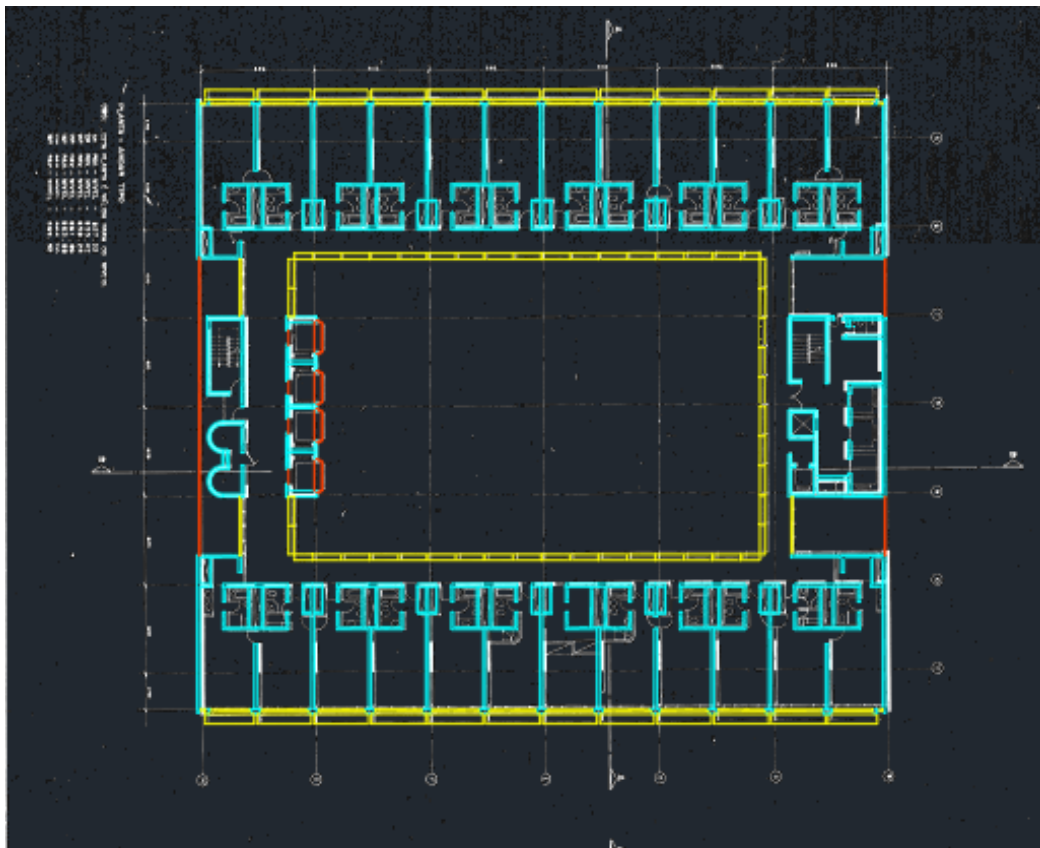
Typical floor redrawing via X-Ref mapping in AutoCAD®.
